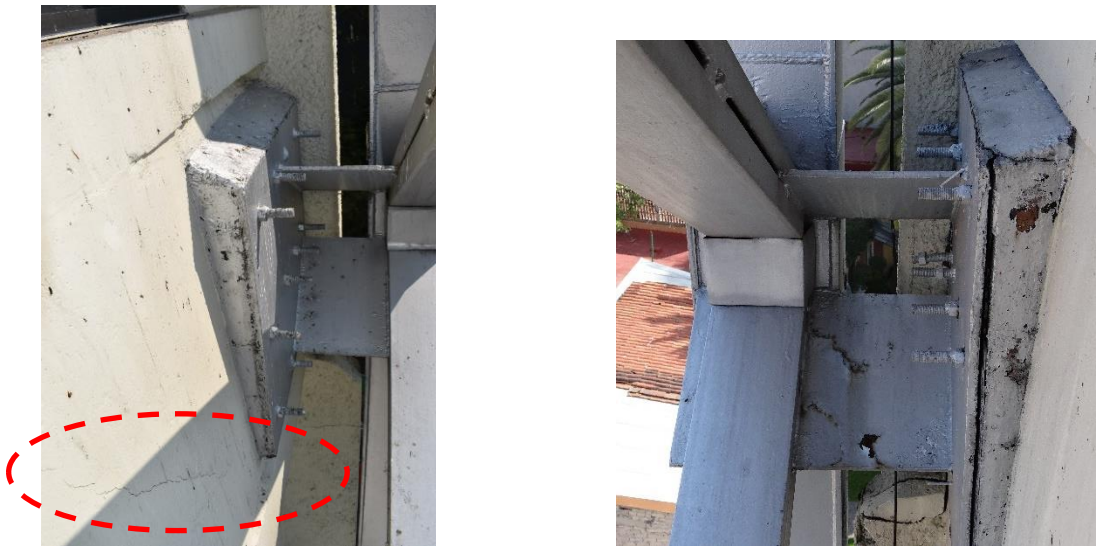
Cracking of spandrel beam at the connection with the steel frame (left) and loosened bolts and gap in connection between RC and steel frame (right)
